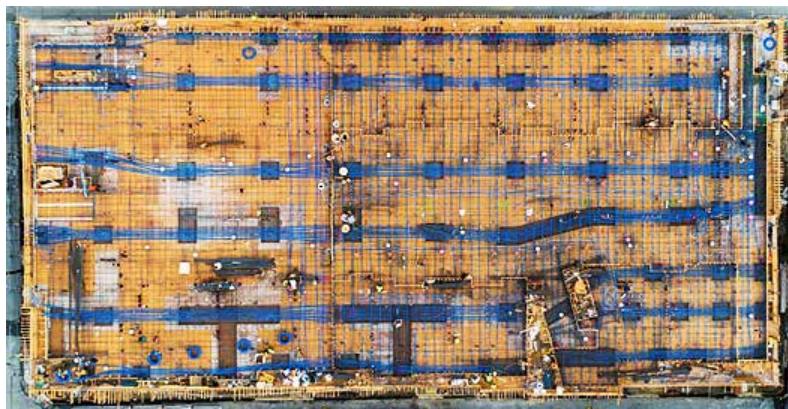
An aerial view of a PT floor system shortly before concrete placement. (Images courtesy of PTI.)
